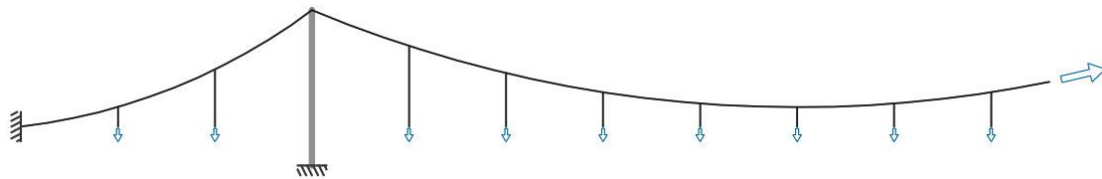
Structural behaviour of the cable system in a suspension bridge. Both main cables and hangers work in tension.
